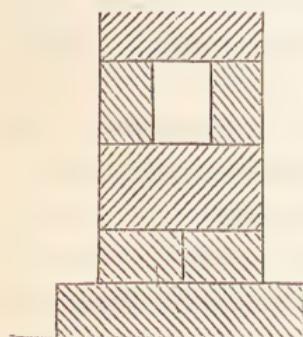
Section of Silverlock's hollow wall, 9 inches thick.
